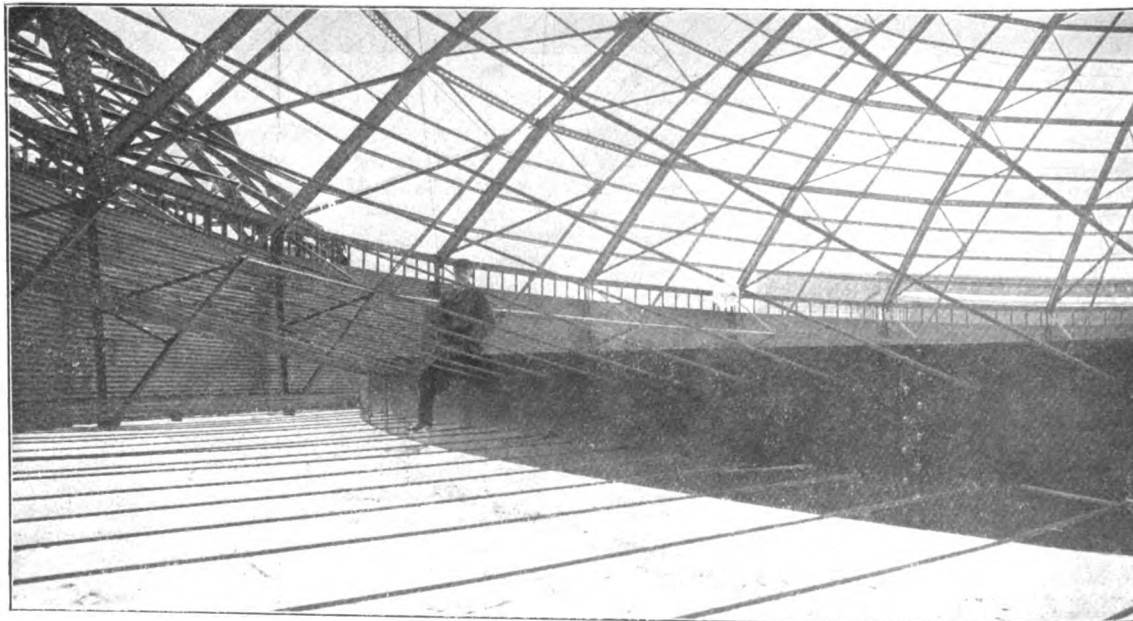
CIRCULAR ANCHOR BAND TO WHICH THE OUTER WALL IS SECURED
